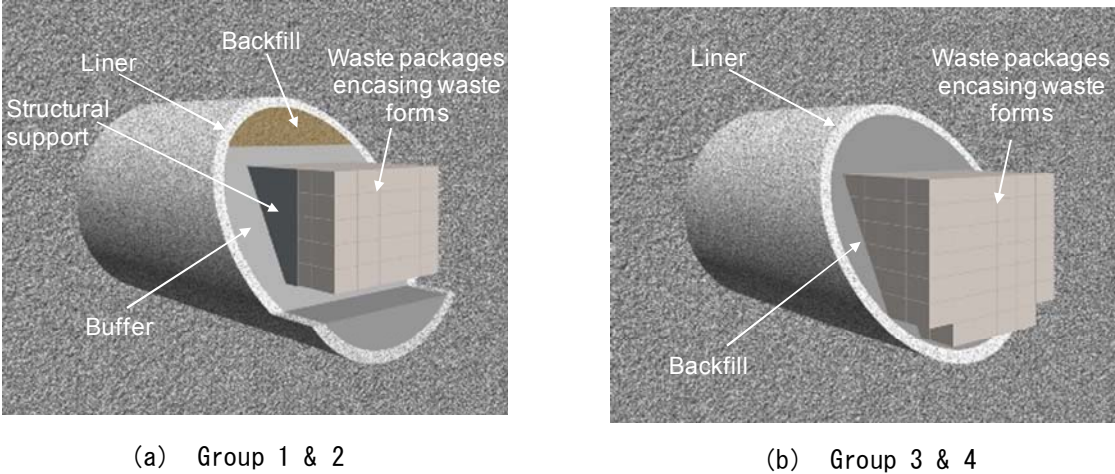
Basic engineered barrier system for the disposal of TRU waste
